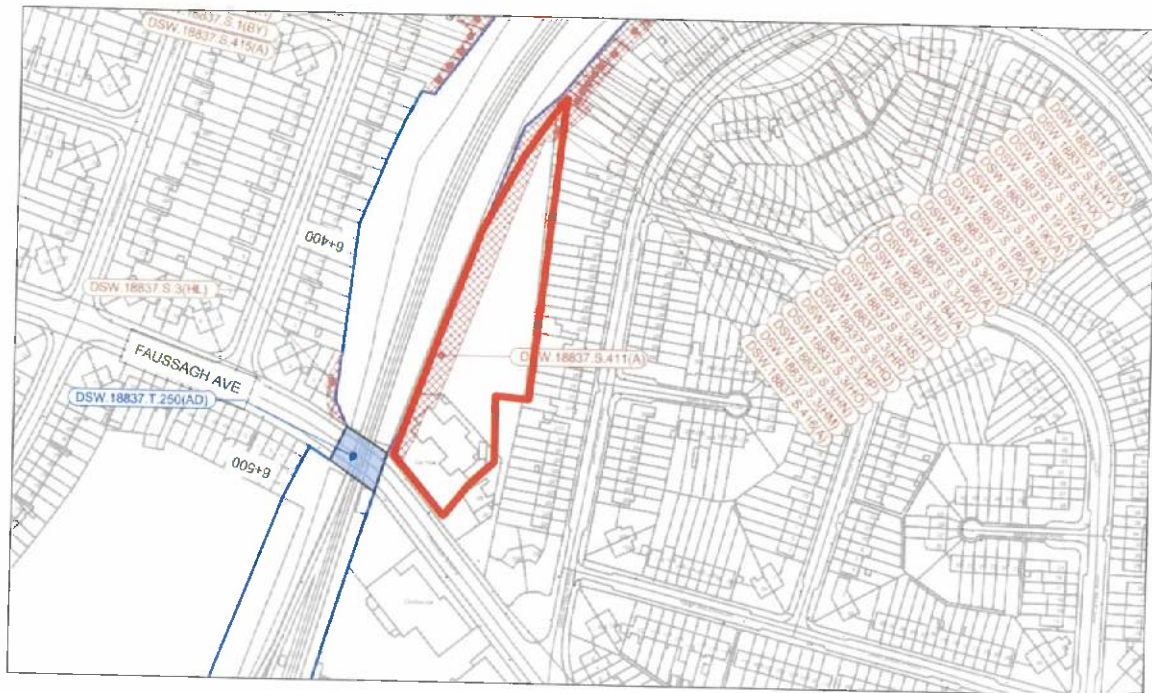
Extract from property plan no. 17 of the Property Plans of the Railway Order with subject site outlined in red.
